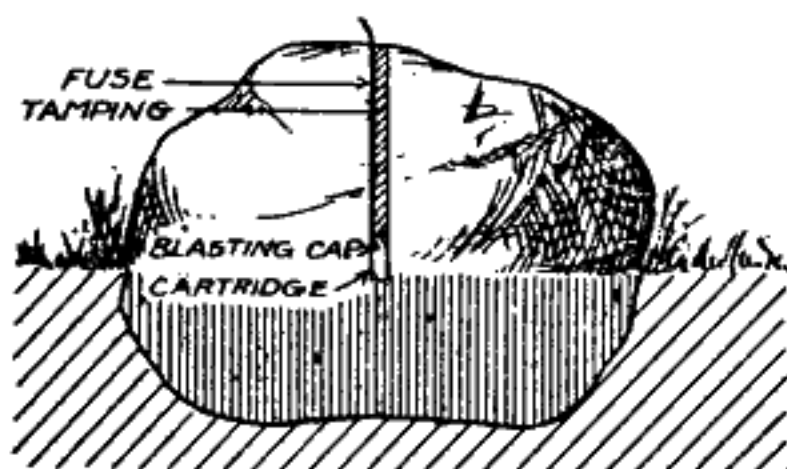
Properly placed block hole charge for shattering a large boulder. The hole is drilled about half way through the boulder, carefully loaded, tightly tamped and fired with cap and fuse.
